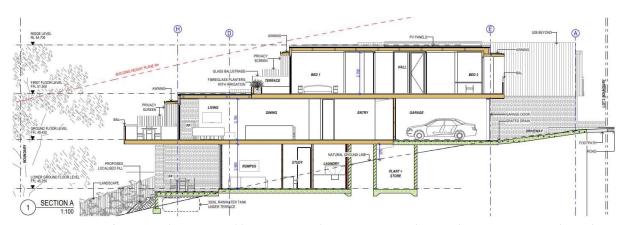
Extract of Section Plan prepared by *MacCormick + Associates Architects* showing Section A through No. 52A.
